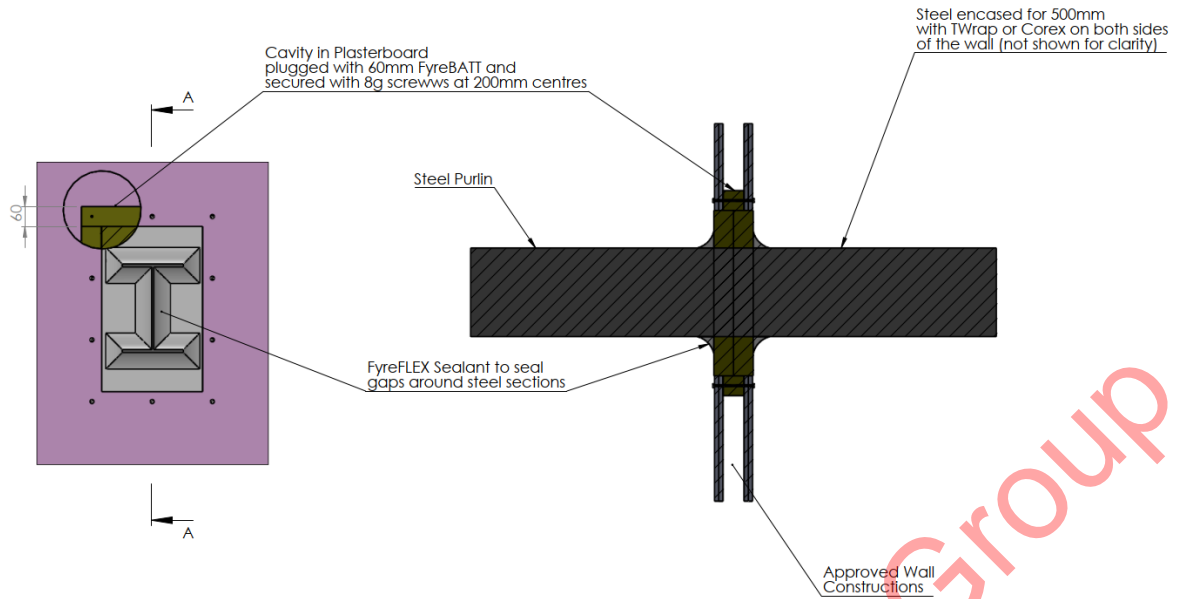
Proposed steel beam/purlin penetration system – detail 10
